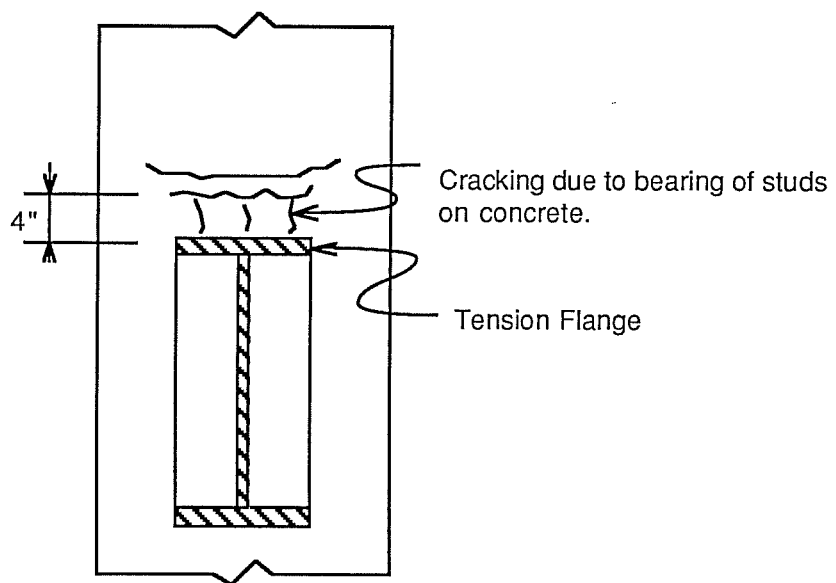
Cracking in Specimens 12 and 13 (shear studs)
